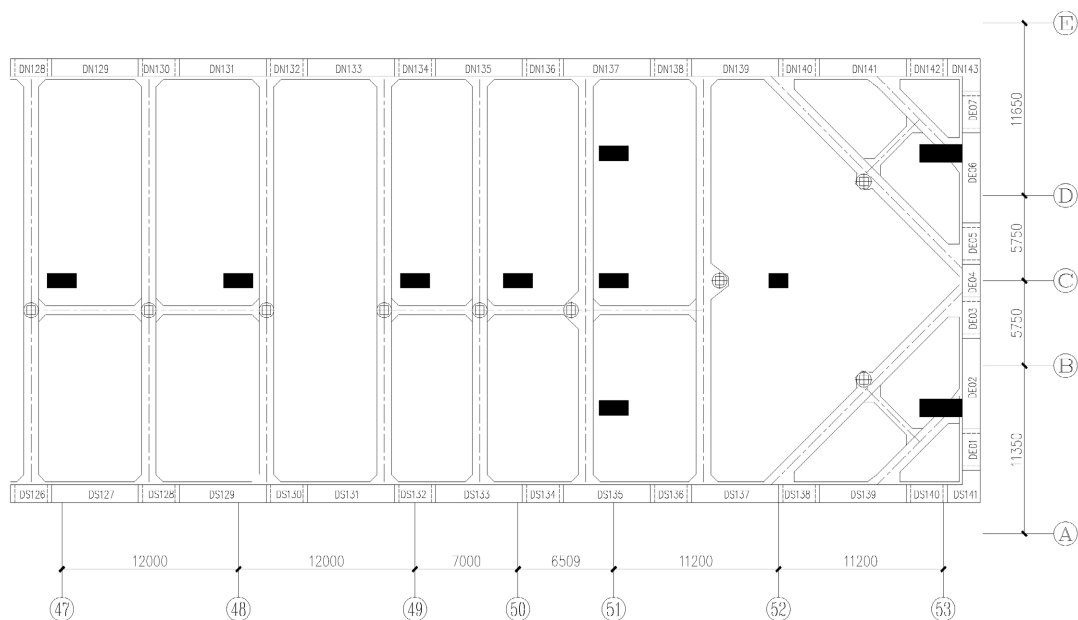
Plan view of the foundation pit (falling depth section and east end head well) in zone 1 of Huajing station
